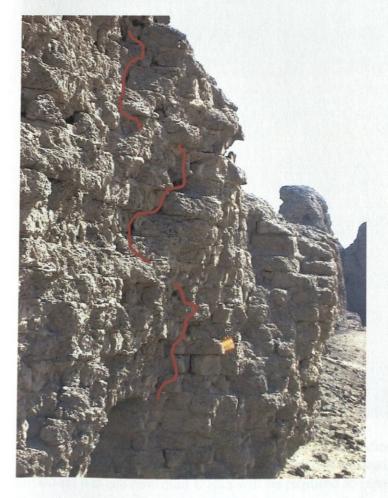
Detail of crack in the East Enclosure Wall. This is a large structural crack that will require grouting because of the depth of the crack.
